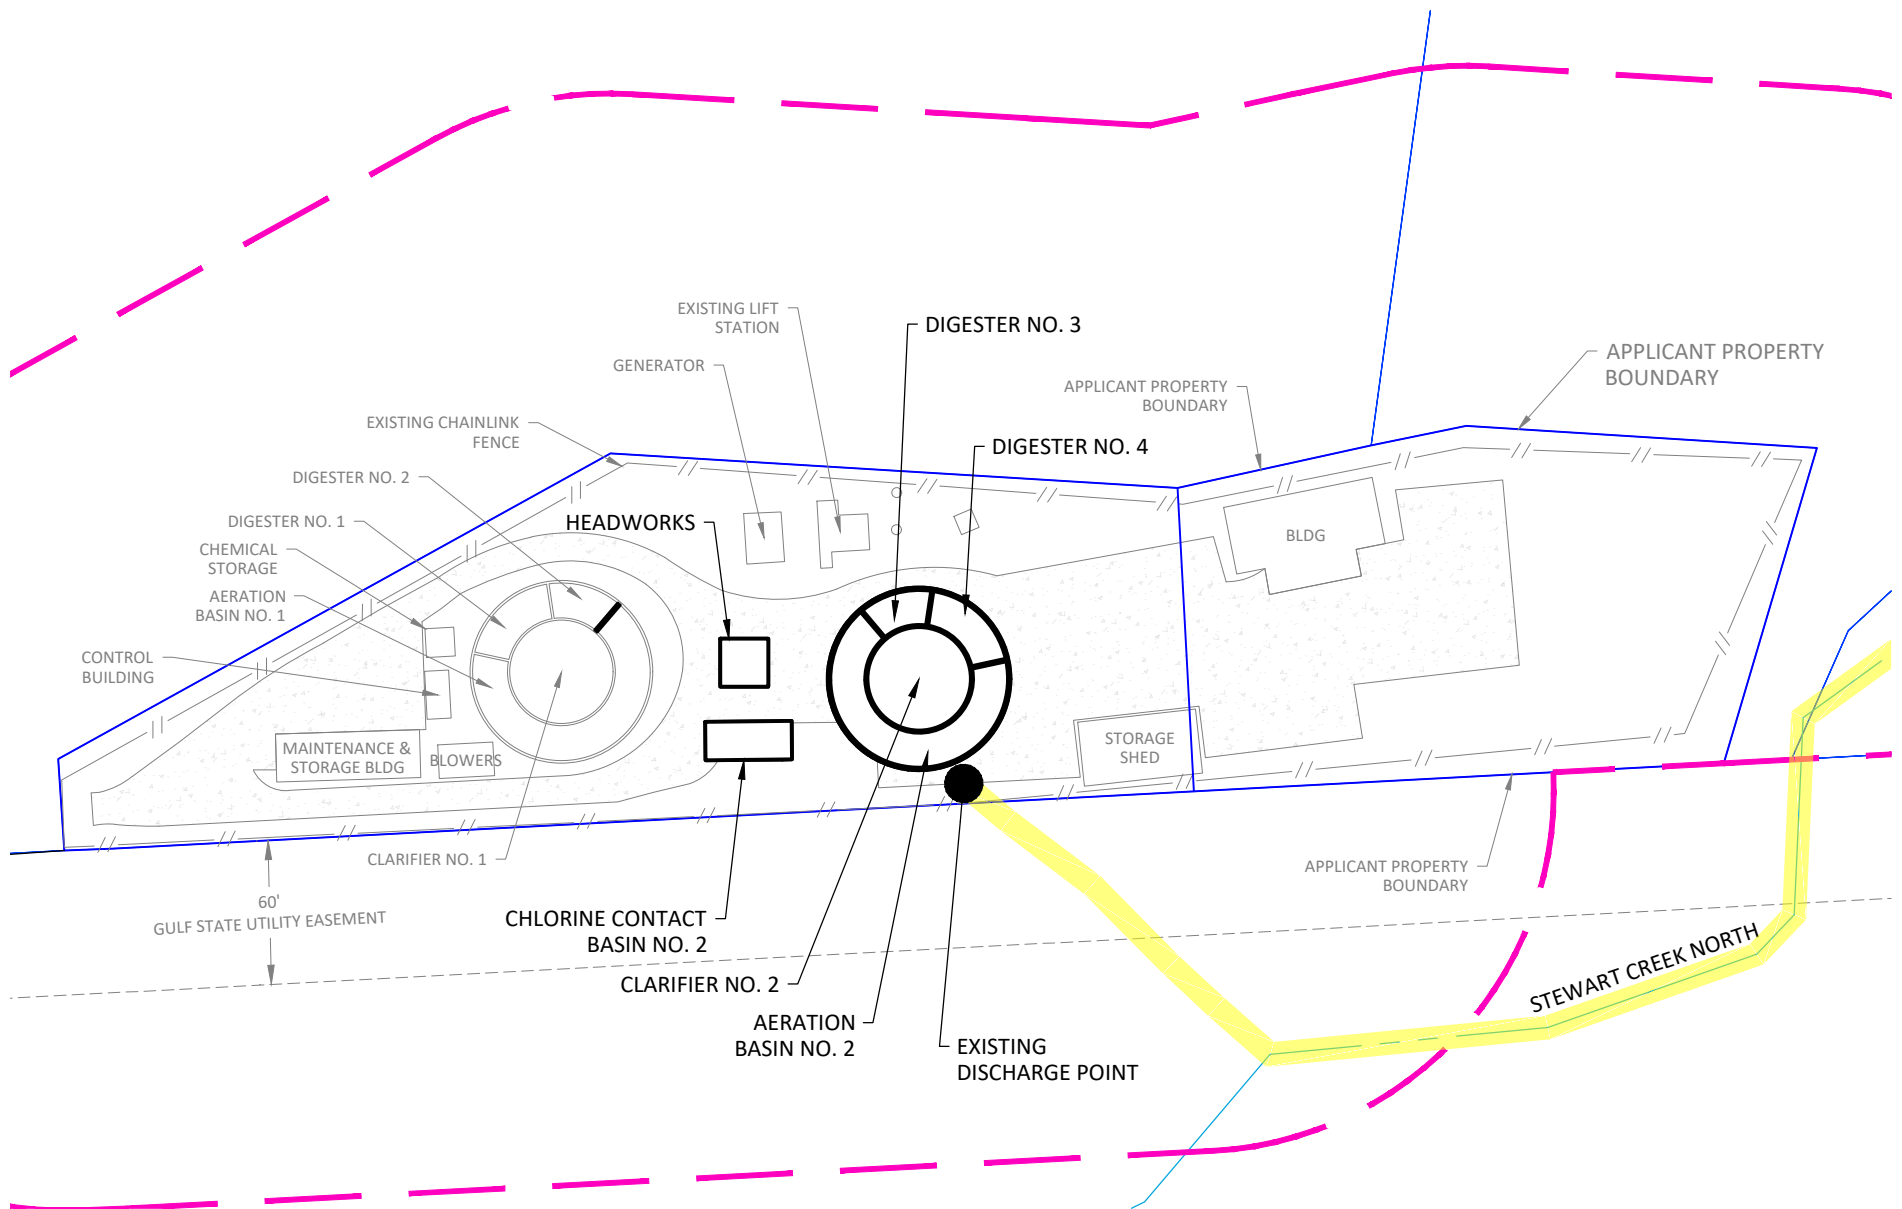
EXHIBIT TITLE:	PROPOSED 0.80 MGD SITE PLAN
